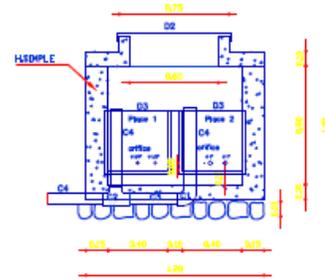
AutoCAD Drawing of the Existing Splitting Tank
